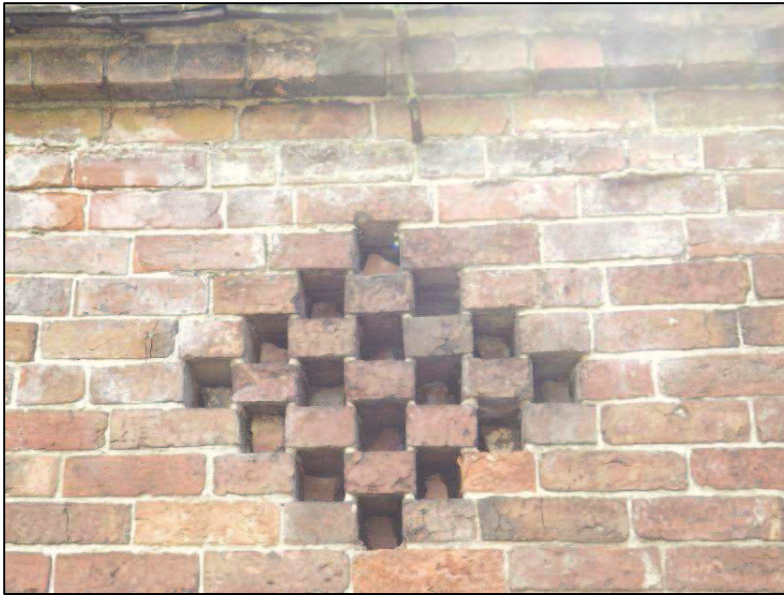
(Shot 10): Honeycomb ventilation on northwest elevation of Barn C, looking southeast.
